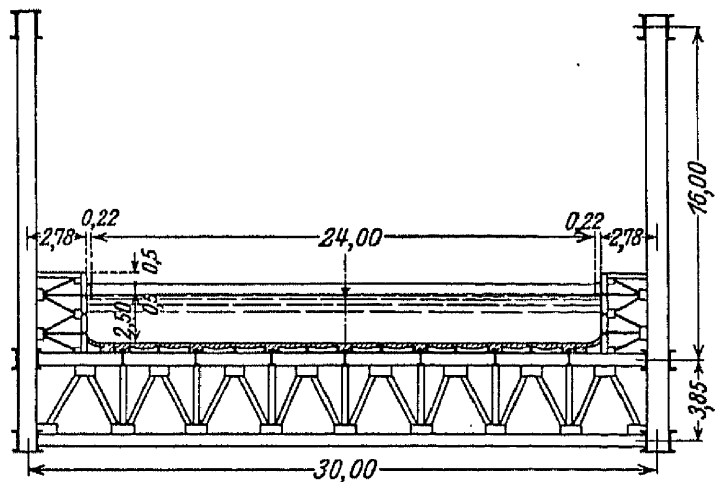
Cross-section of the canal bridge over the Elbe River. Designed by L. Eilers of Hanover
